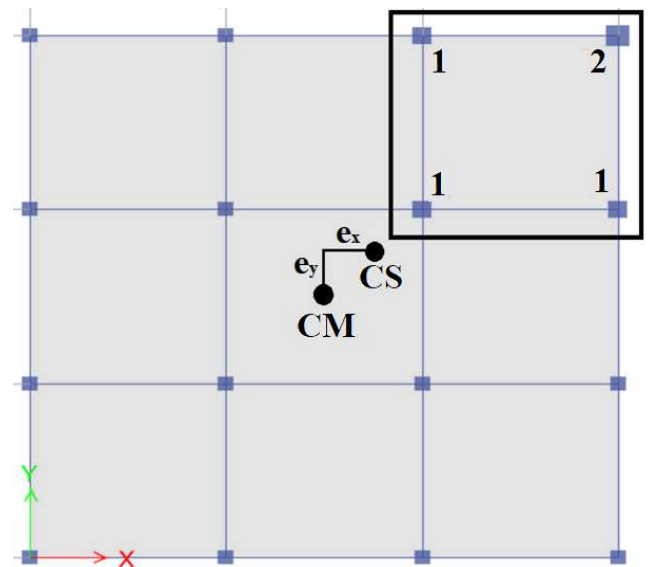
Plan of G+5 storied RCC Frame Building with Eccentricity
